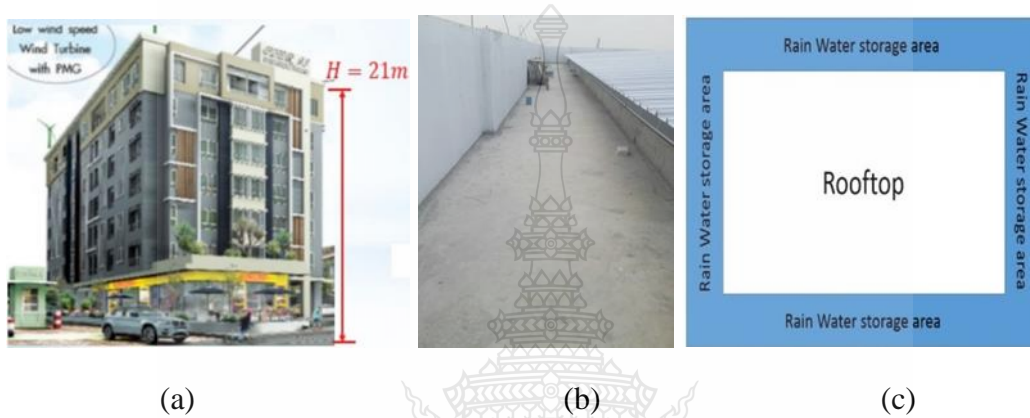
(a) PIER 93 high-rise building, (b) Roof gutter area, and (c) Water storage area on rooftop
